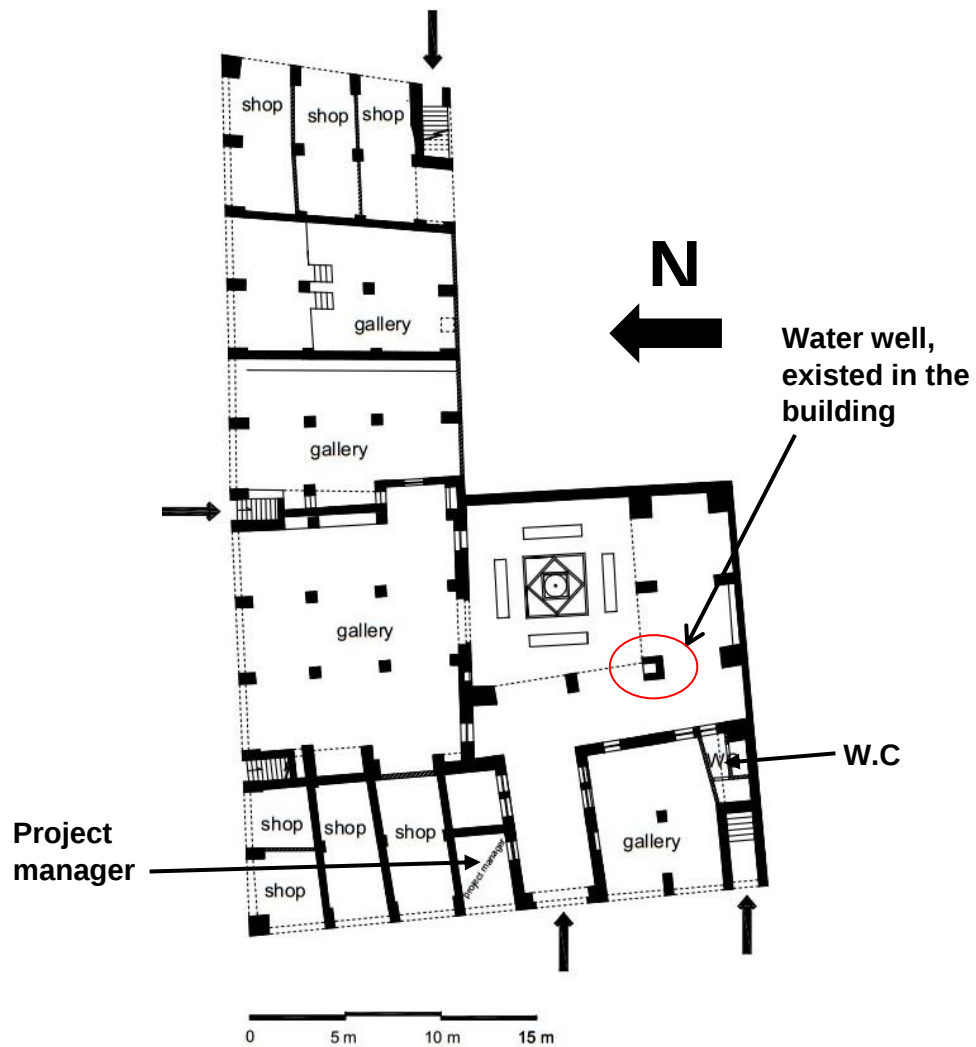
Proposed plan for the Ground floor of Khan Al-Jamal
